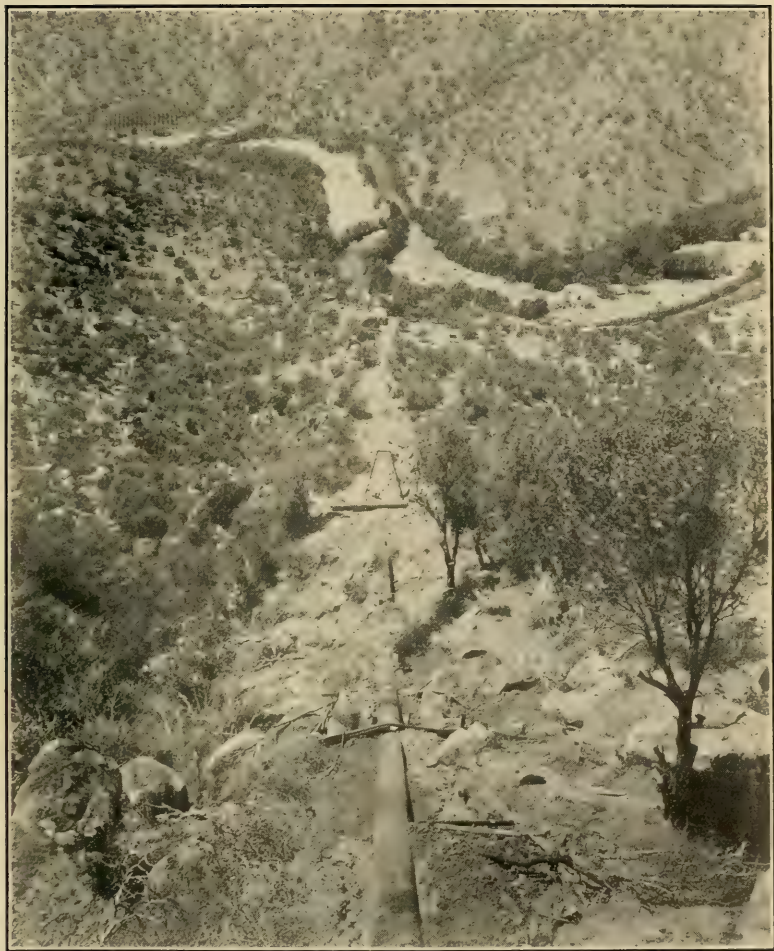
THE PIPE LINE OF THE MT. WHITNEY PLANT, LOOKING DOWN TO POWER HOUSE.
